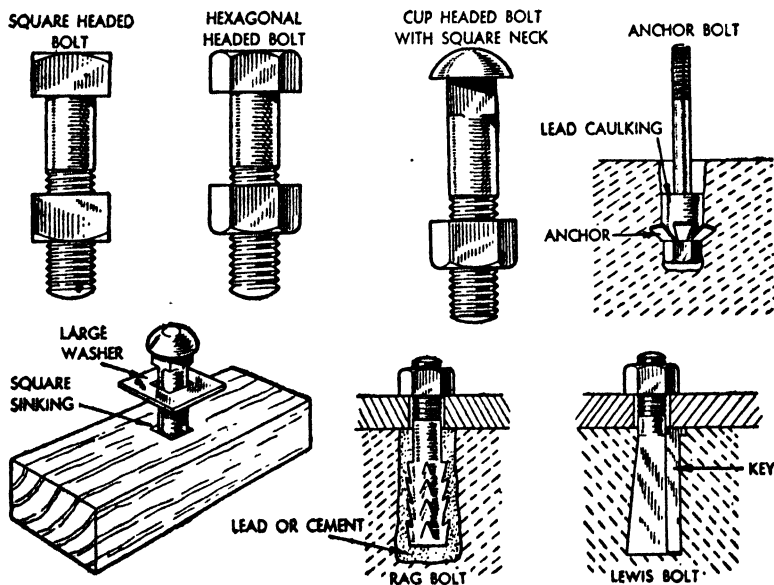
Bolts for fixing purposes. Cup-headed bolts are frequently used for connecting timber together, as they are much less prominent on the face of the work.
